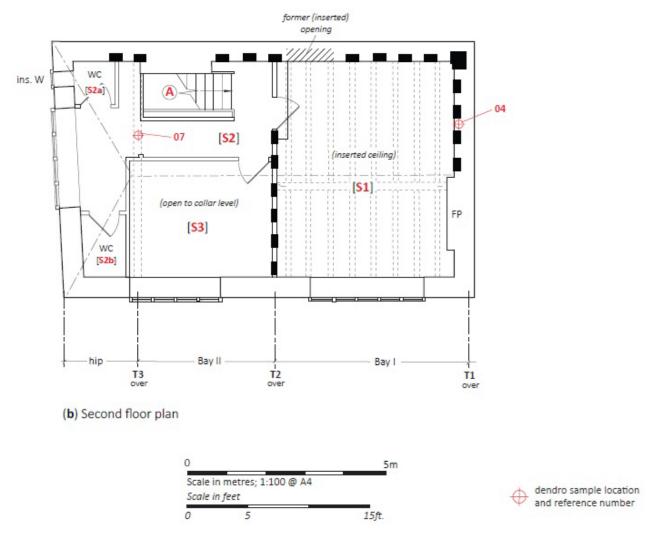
Second-floor plan showing the location of two samples taken for dendrochronology [adapted from an original drawing by Ric Tyler]
